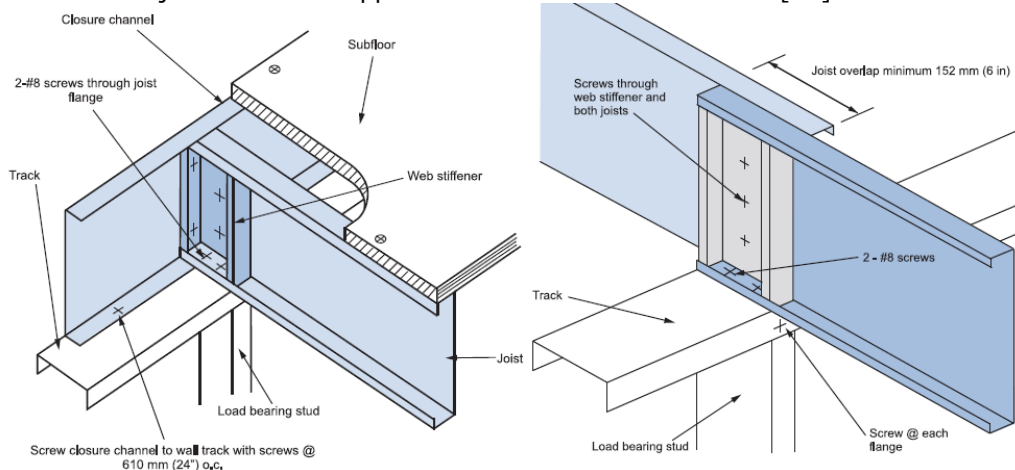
Floor Joists and Lapped Joists Supported on a Loadbearing Stud Wall [40]
